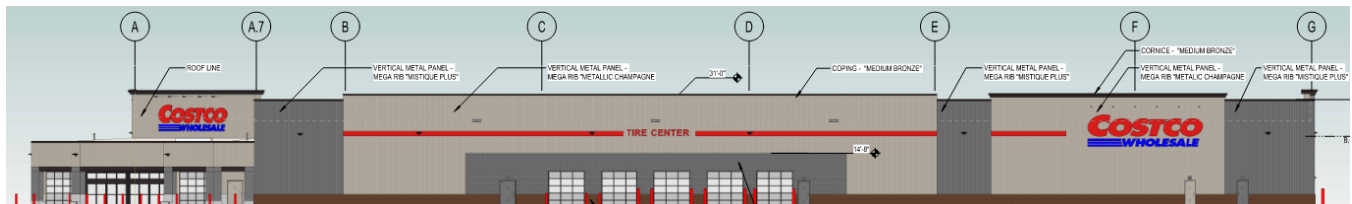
Elevation showing wall signage (east and partial southeast façade)
